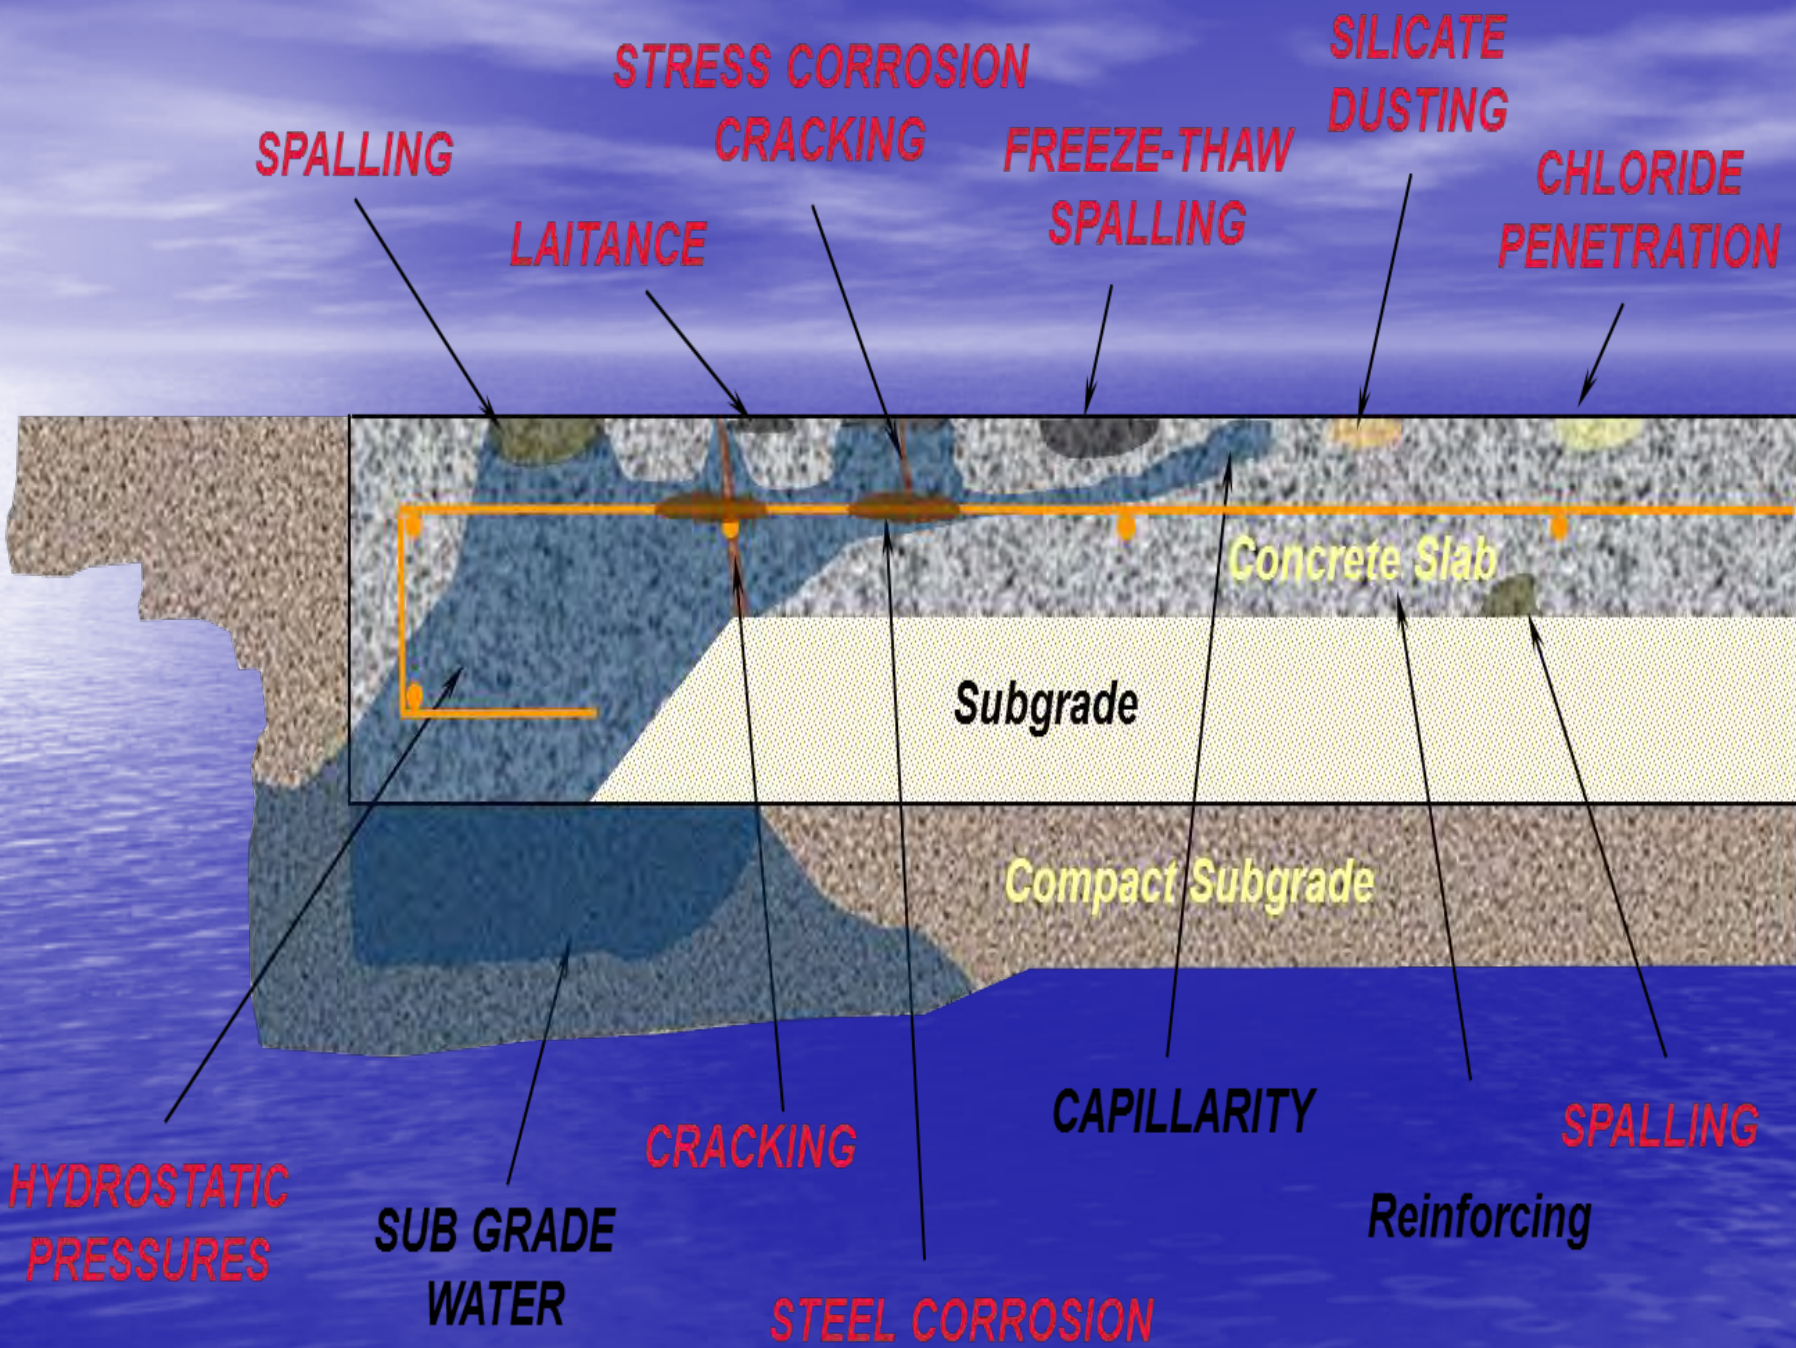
Fig. A & B: Surface cracks allow water into the concrete to cause further damage.
